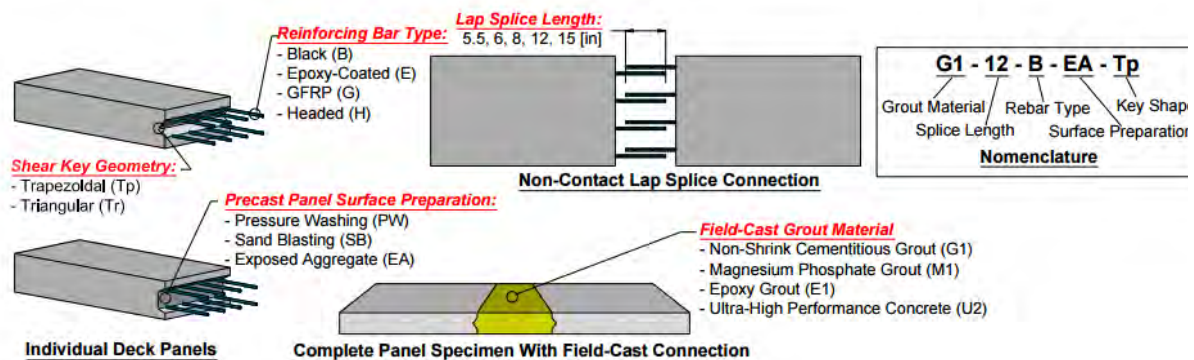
Test Variables Used for Precast Deck Panel Connections (Haber and Graybeal, 2014)
